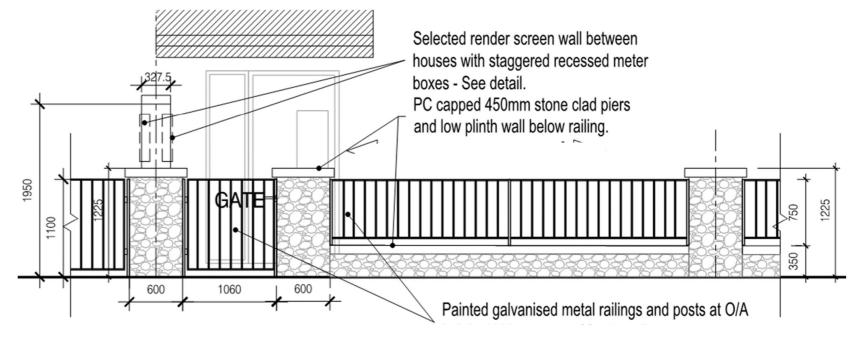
1.35m painted metal railings on low stone wall between capped stone piers along Sea Road only.
